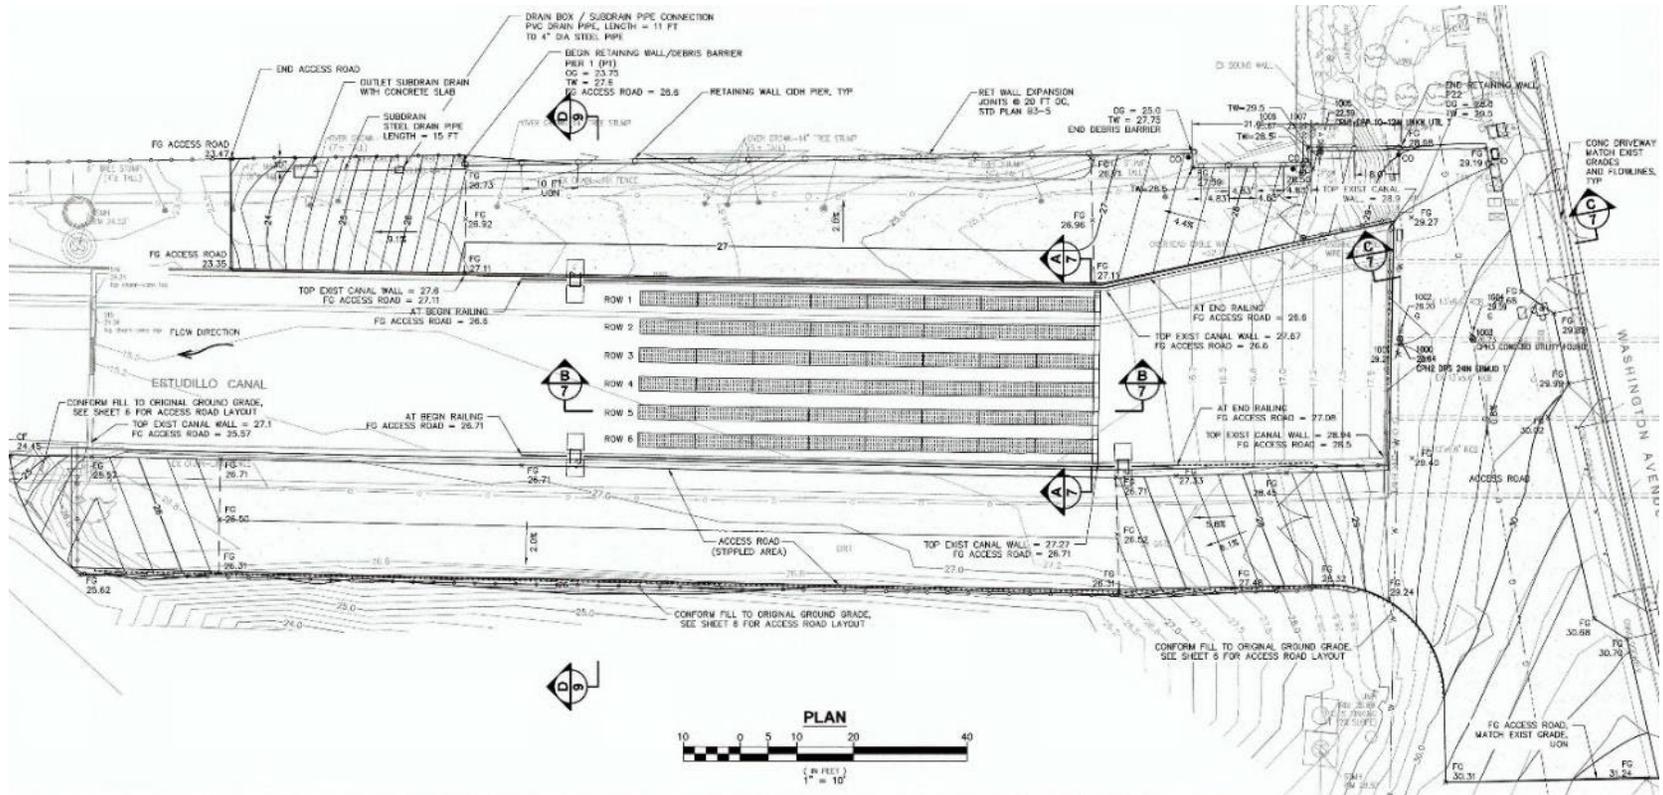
Estudillo Canal Multi-screen GSRD, grading and drainage plan
